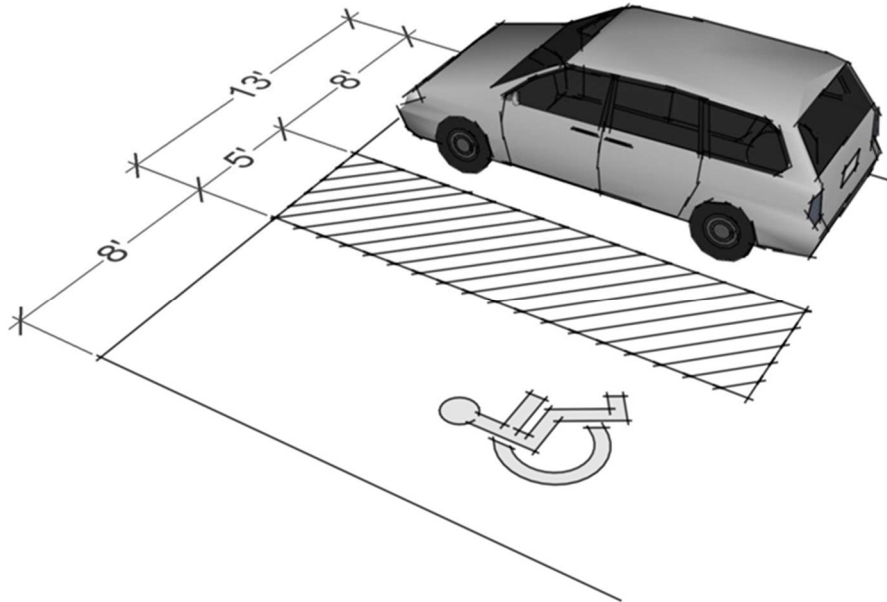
Illustration of Access Aisle Between Parking Spaces
